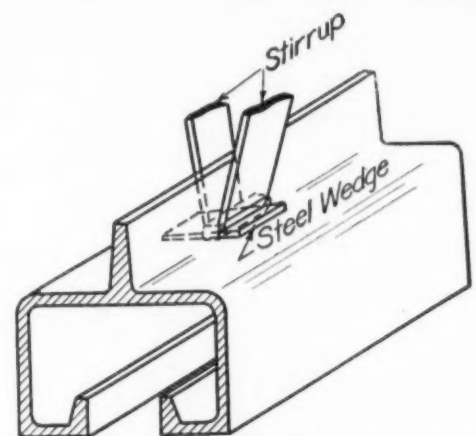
A. DETAIL OF BOX RAIL INSERT.
